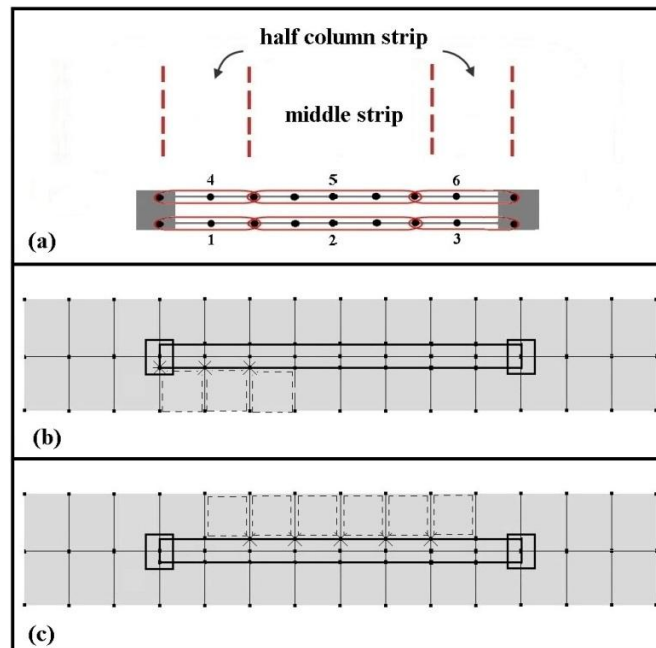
Locations of section cuts in the slab around a shear wall-slab connection: (a) schematic view, (b) an example of ETABS model (section cut No.1 and its corresponding components), (c) section cut No.5 and its corresponding components
